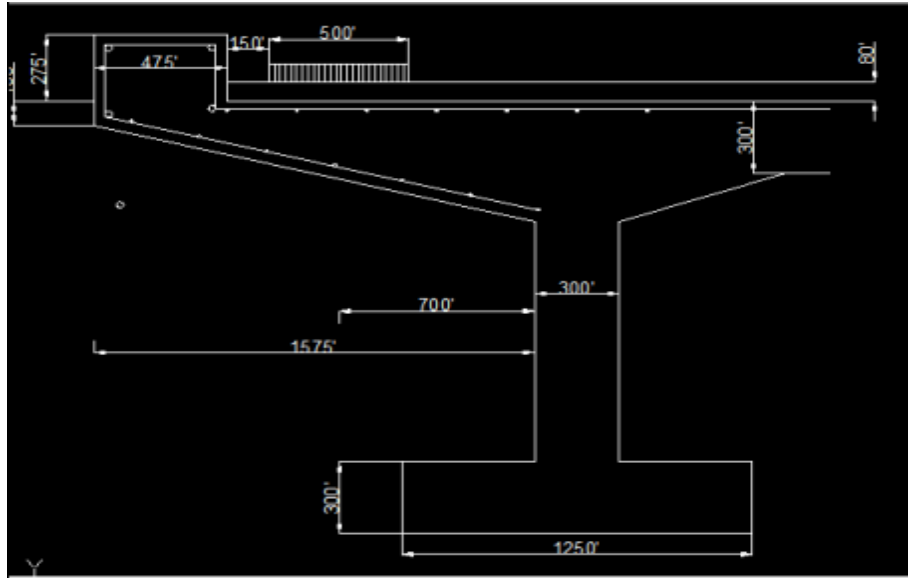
TYPICAL REINFORCEMENT FOR CANTILEVER SLAB
